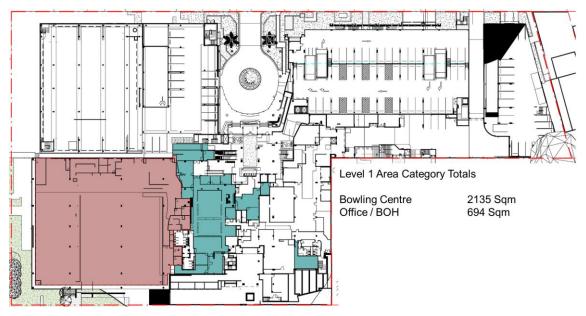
Proposed Level 1 layout (Source: Altis Architecture)
